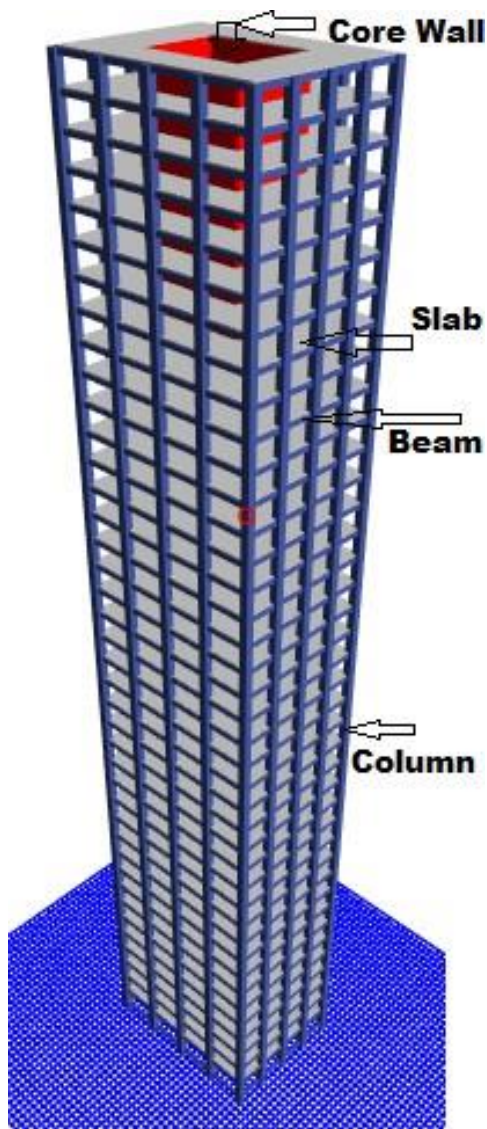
3D View of rectangular geometry without outrigger belt truss system for zone III
